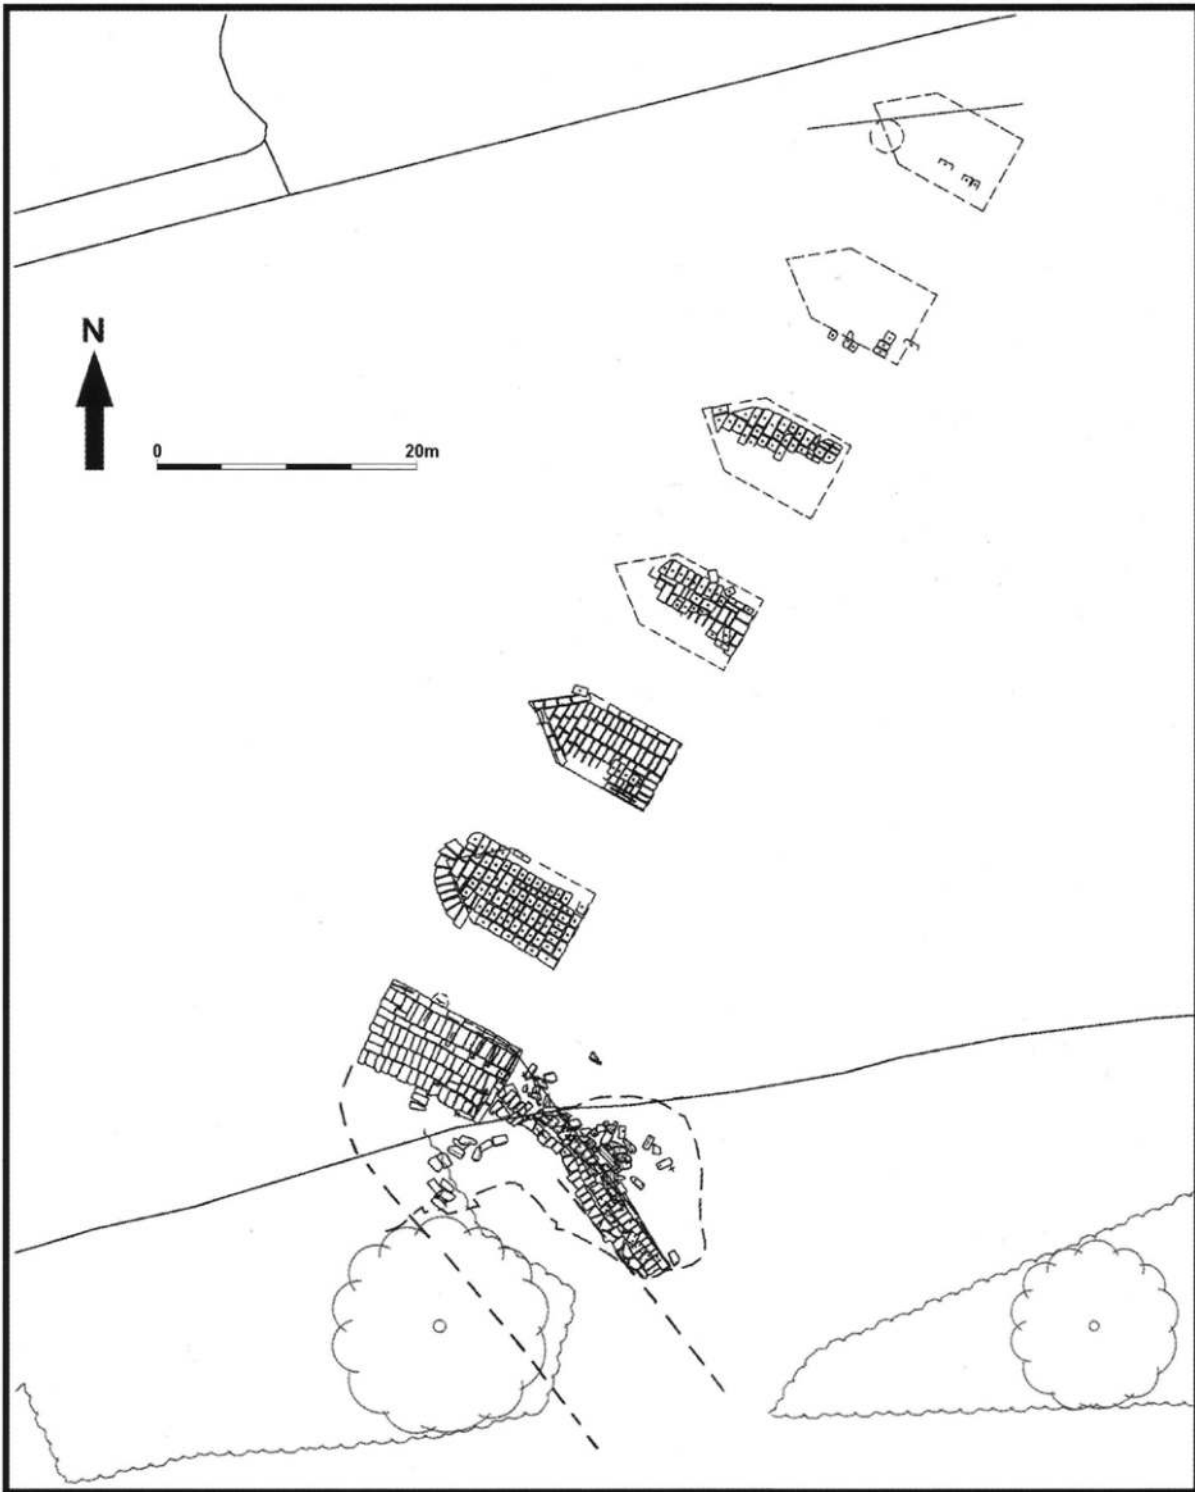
The plan of the Roman bridge at Corbridge showing the revetting wall on the eastern, downstream, side of the southern abutment.
